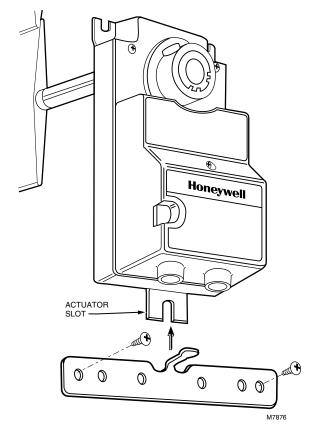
Installing mounting bracket on ML6184 Non-Spring Return Direct Coupled Damper Actuator. NOTE: Install mounting bracket so that mounting bracket tab is centered in actuator slot.
